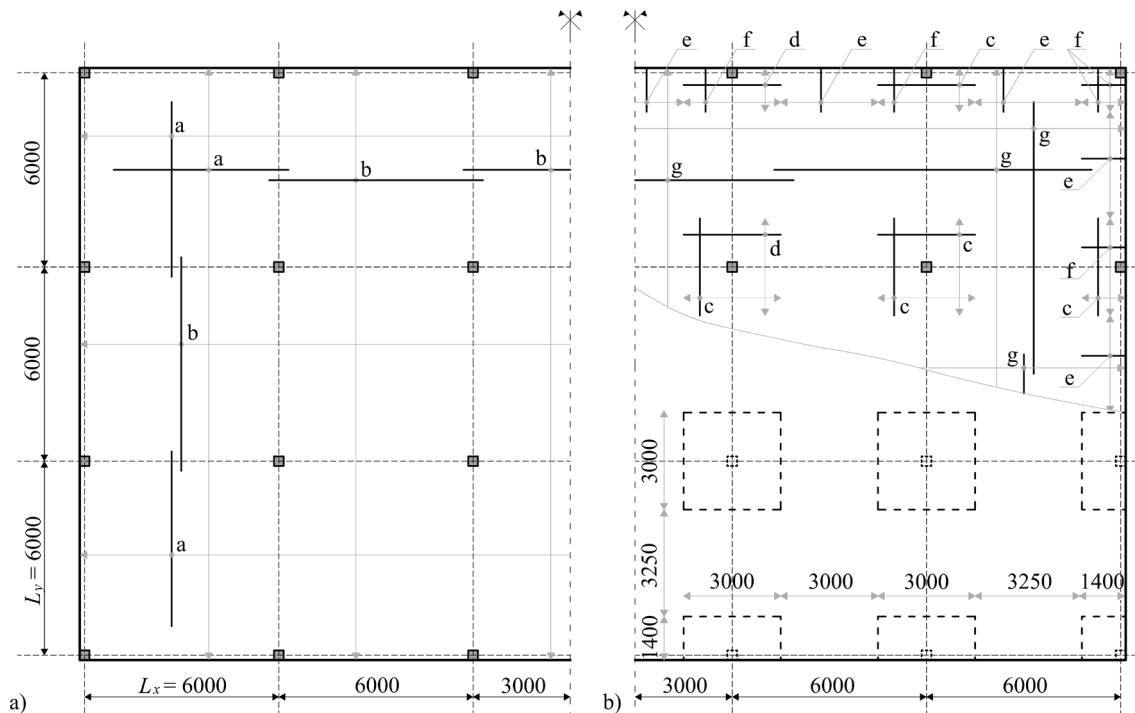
Geometry of the case study along with: a) bottom reinforcement layout; b) top reinforcement layout
